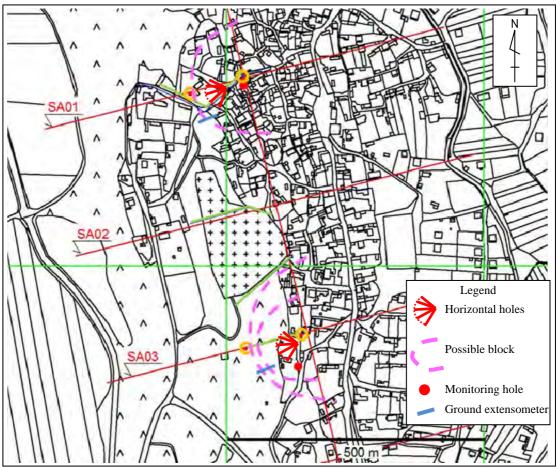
Possible locations of horizontal holes for Arapi site on a plan
